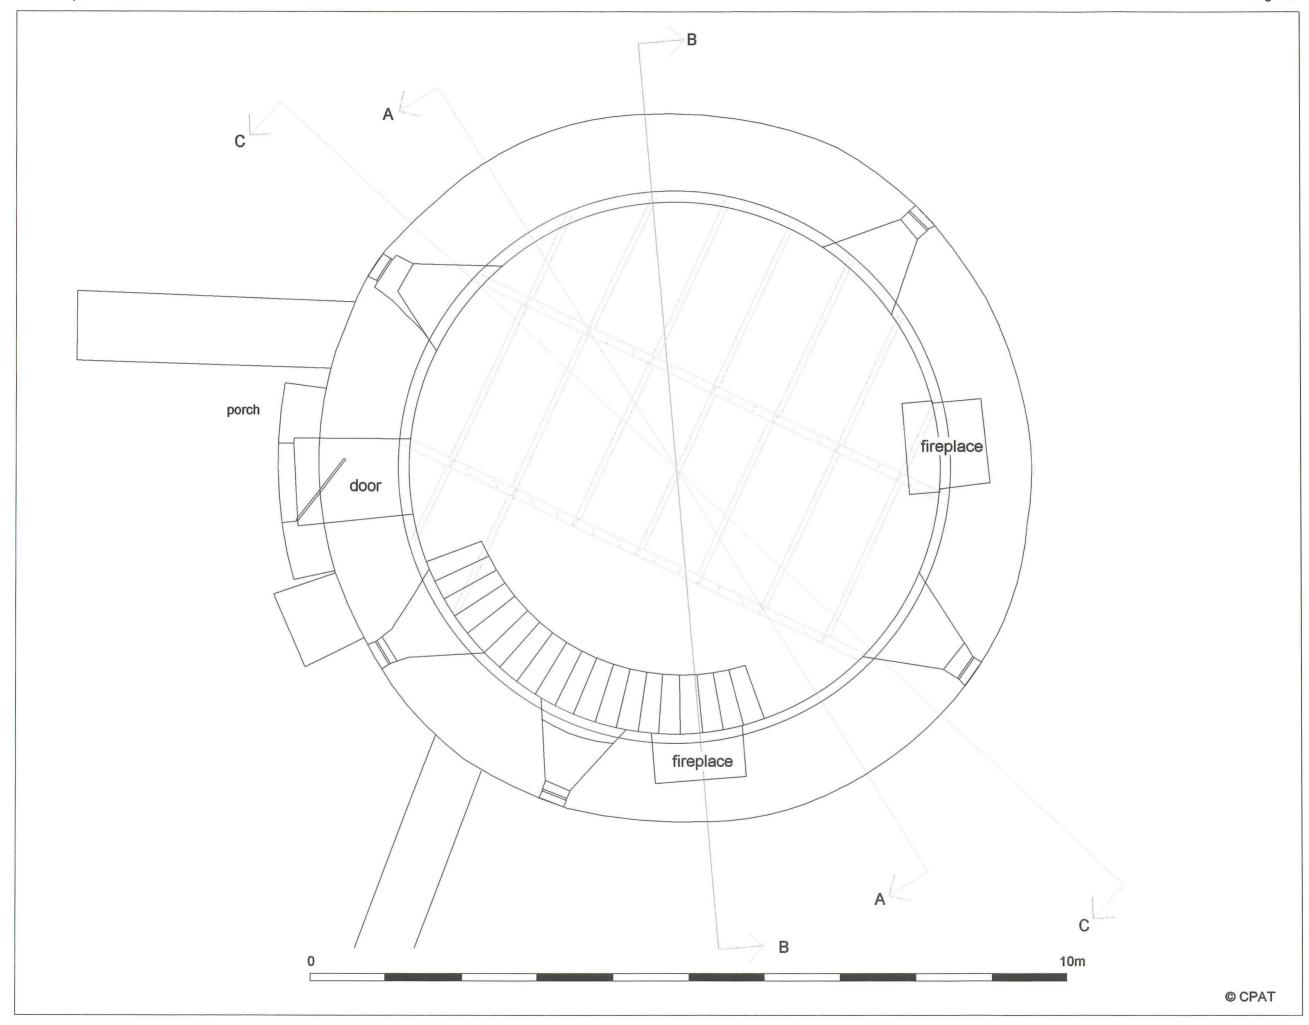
Roundhouse Farm north-east tower, ground floor plan
